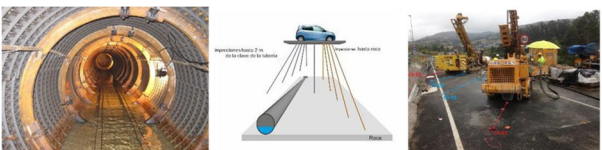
Platform subsidence, drainage works channelling and embankment stabilisation.
